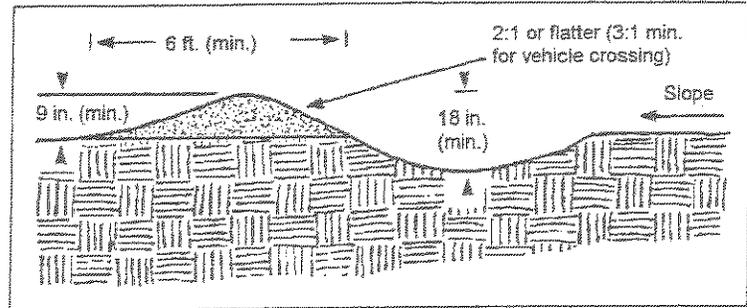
D. Cross-section view of a right-of-way water bar.
